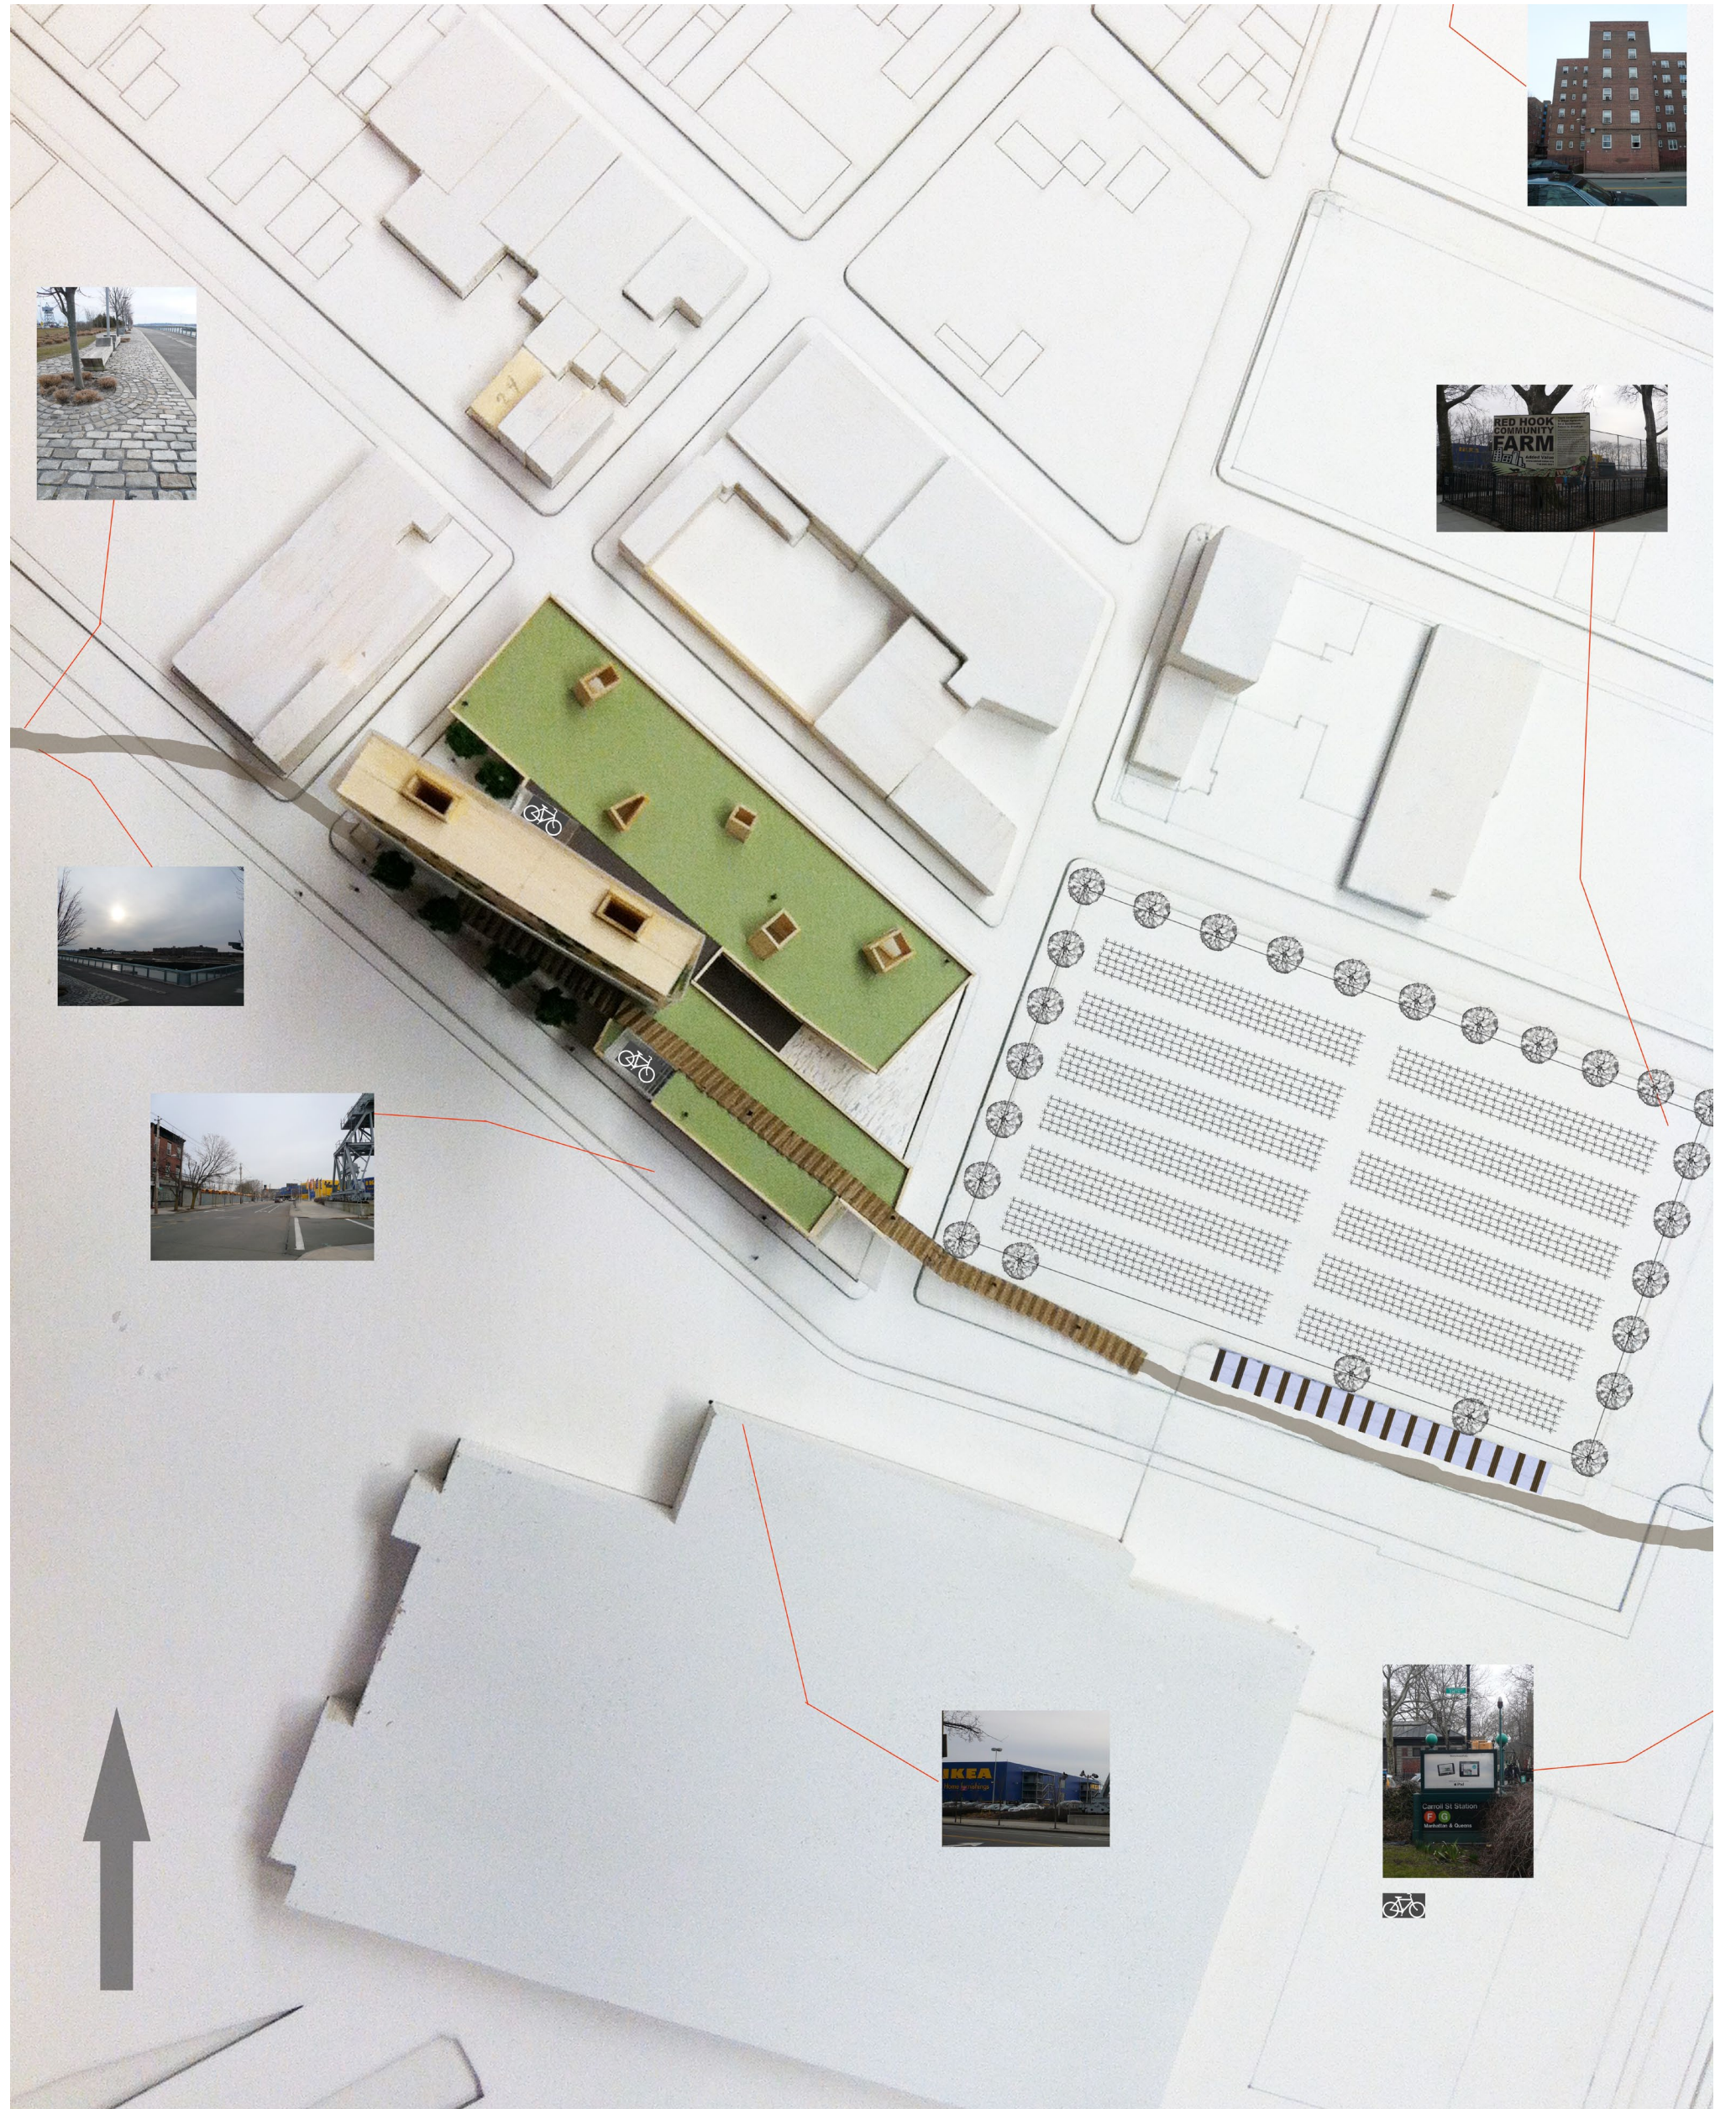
1/64"=1' Site model aerial photo plan diagraming important urban elements.
